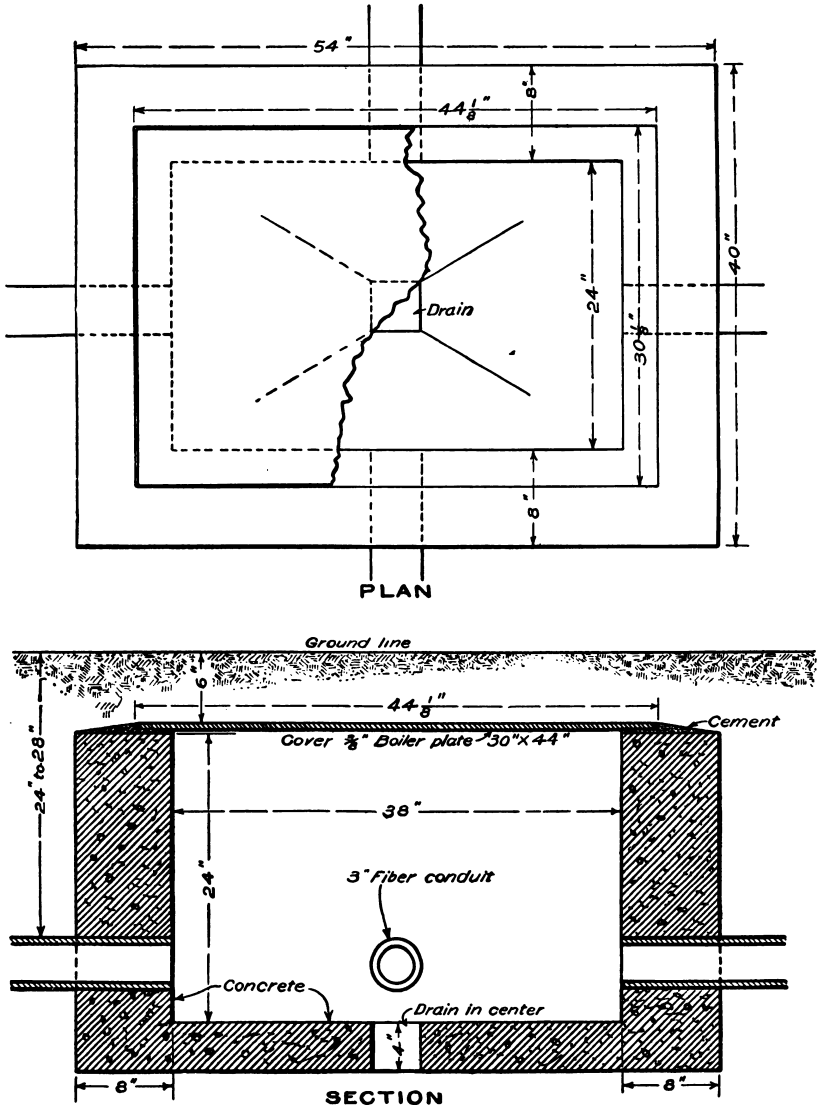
CABLE SYSTEM, MANHOLE.
